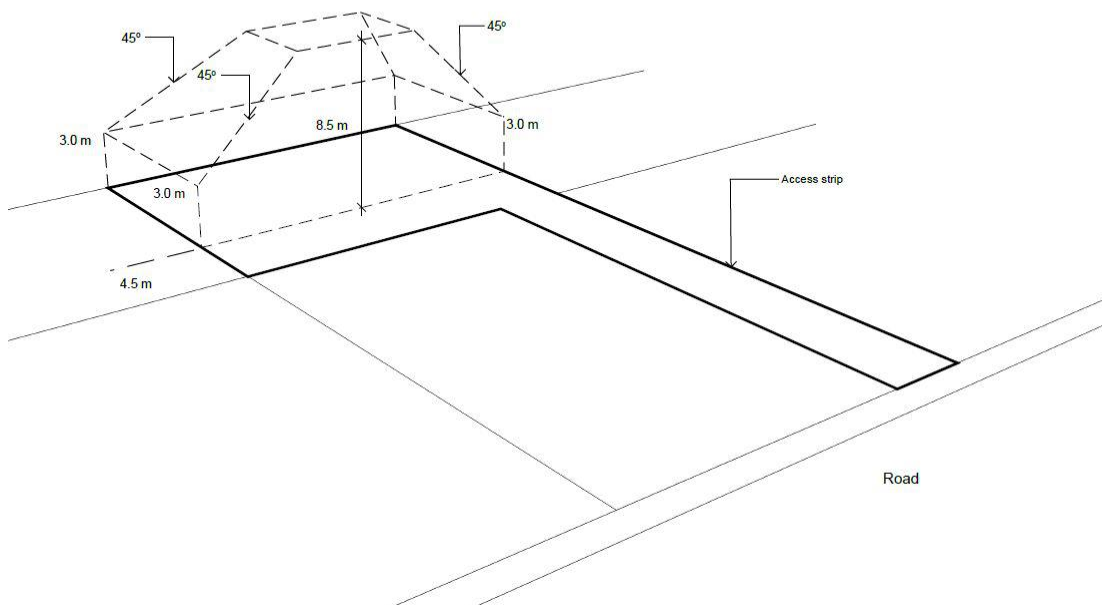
Building envelope for internal lots as required by clause 10.4.2 A3(a)
